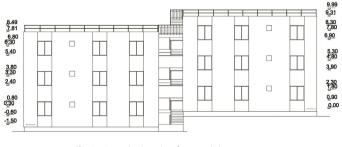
A north elevation for type (B) apartment. *Source*: (HUDC, 1986).
